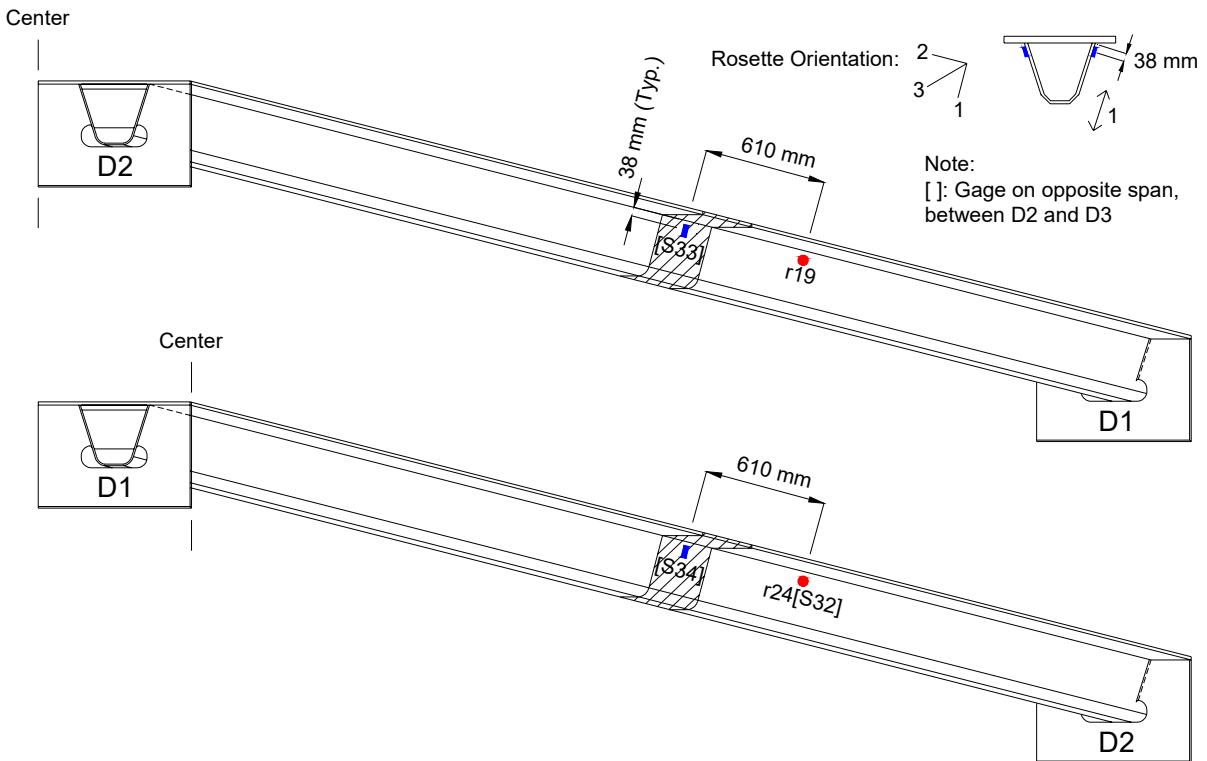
Specimen 2: Strain Gages in Outer Surface of Rib R2 near Rib-to-Deck Welds
